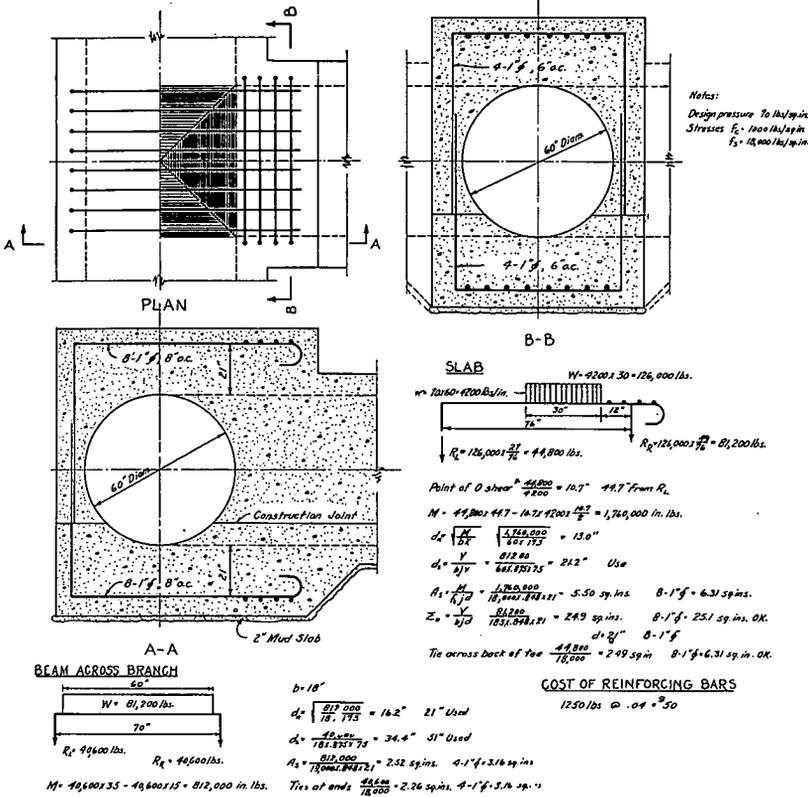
TEE, CONCRETE ENVELOPE REINFORCEMENT.
